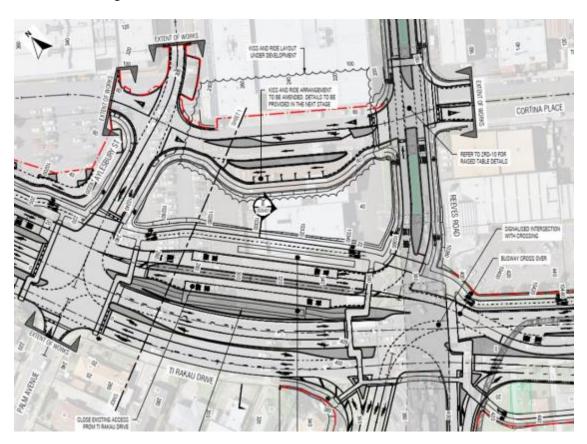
Proposed Pakuranga Town Centre major interchange station layout
